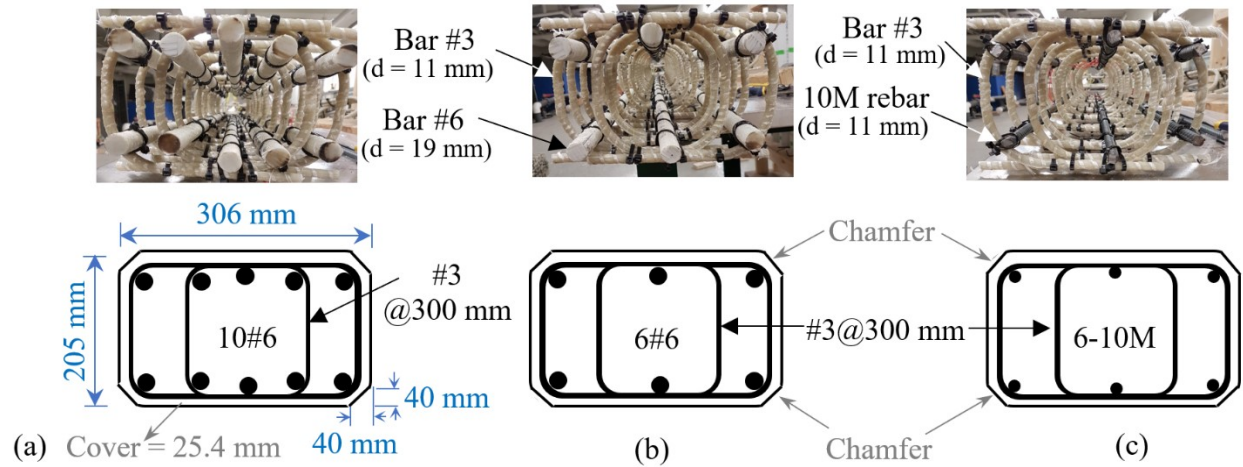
Rebar layout: (a) GFRP-RC column with 4.80 % reinforcement ratio; (b) GFRP-RC column with 2.87% reinforcement ratio; (c) steel RC column with 1.00% reinforcement ratio.
